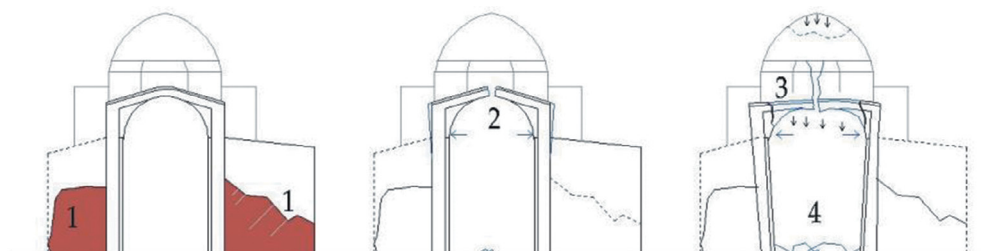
Collapsing process cross section. 1. Adjoining buildings collapse. 2. Load-bearing walls movement. 3. Damage at toral arches. 4. Vaults collapse.
